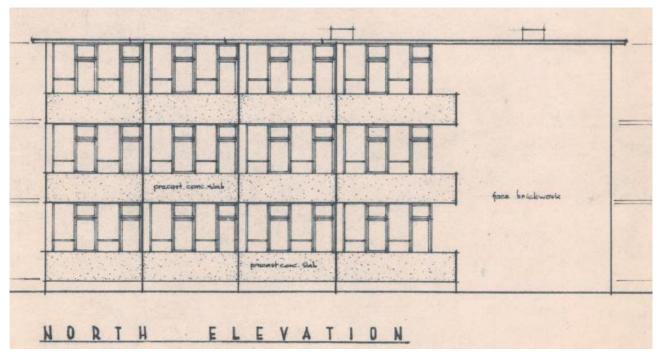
Front or north elevation, Dandenong Road (Source: Council Building File)
